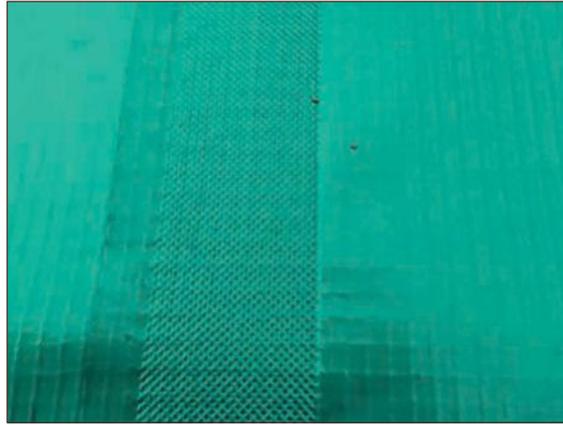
Wedge weld on an LDPE aluminium gas membrane, where the installer used metal nip rollers. This destroyed the top layer and probably the bottom layer, leaving aluminium exposed between the weaves. This failed dielectric testing along all joints (courtesy MEC Environmental Ltd)
